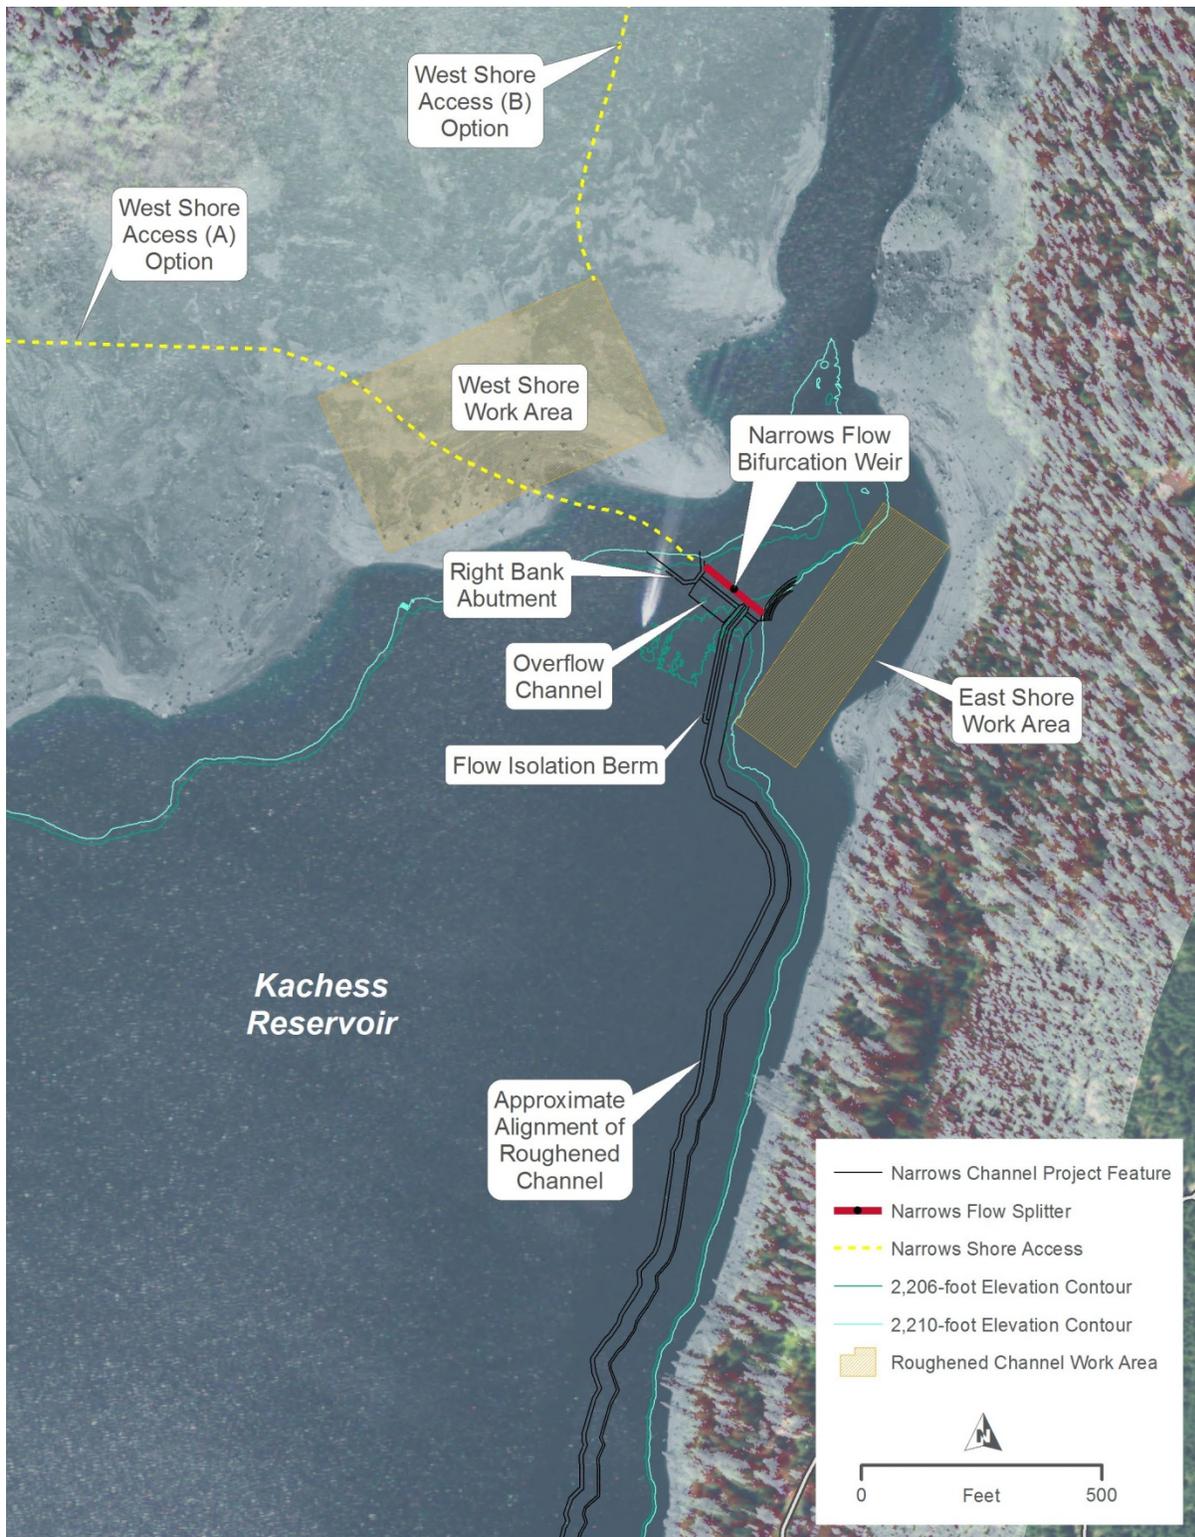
Proposed Volitional Bull Trout Passage Improvements at the Kachess Narrows
